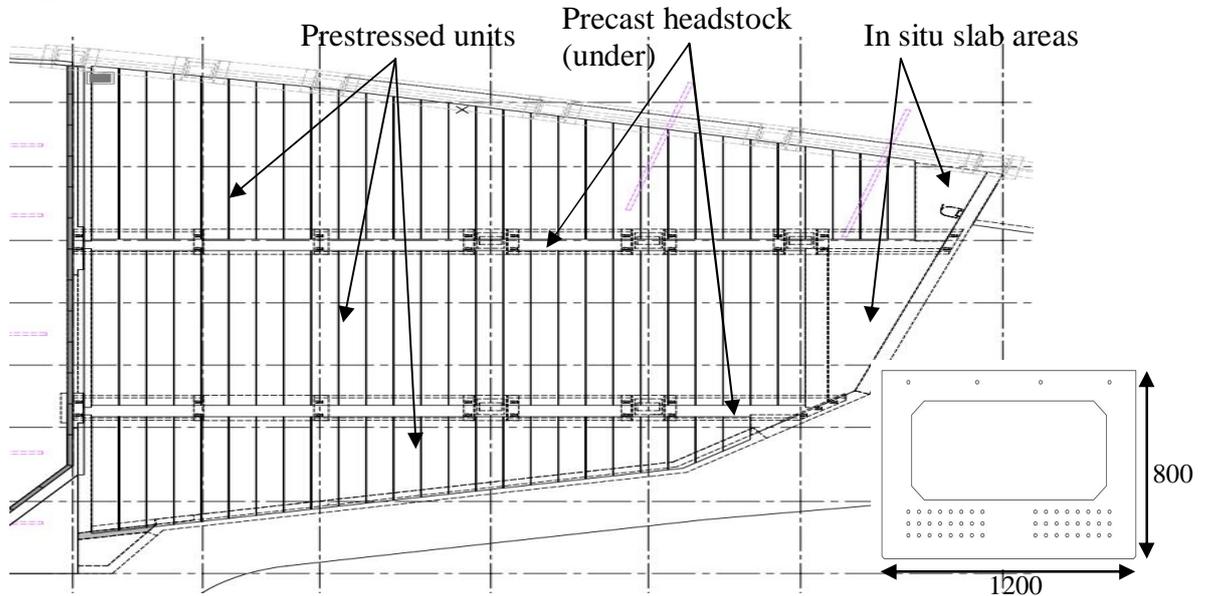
Roof plan and a cross-section of a typical prestressed unit
